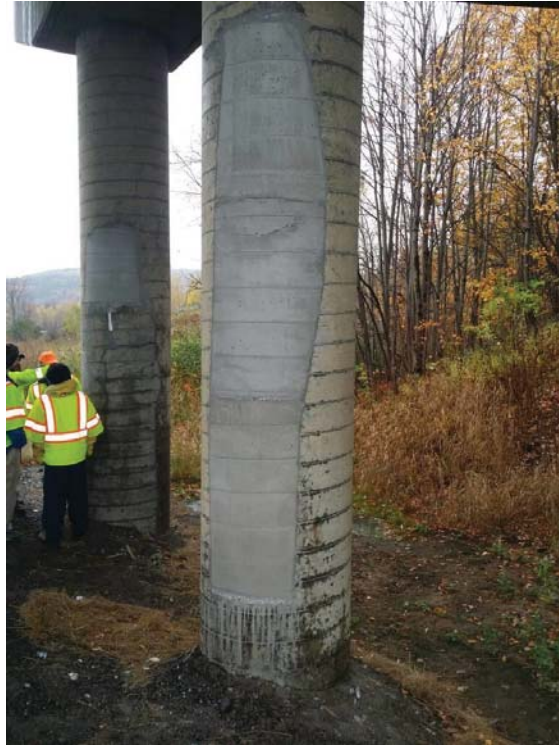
Possible dry shrinkage cracks on concrete column that has had a 6" thick concrete jacket around column.
